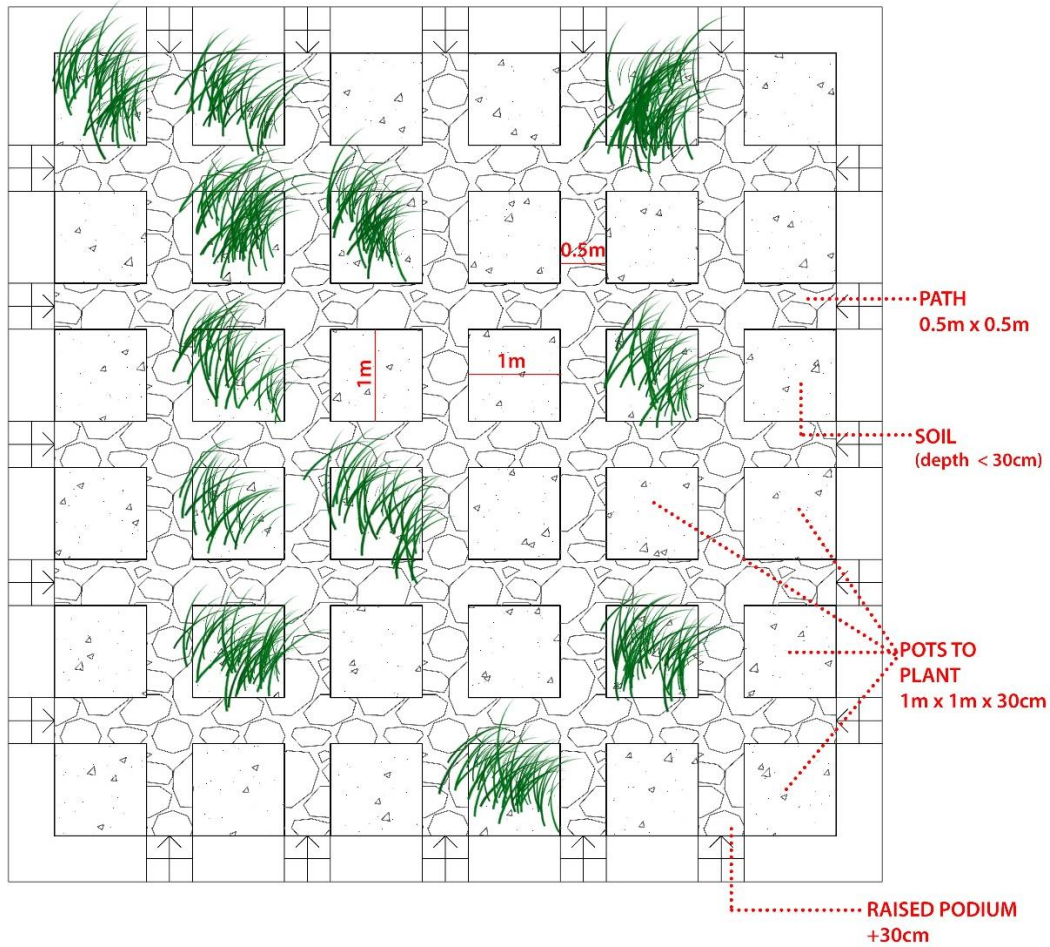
Module System for extensive green roof - plan (Prepared by: author)
